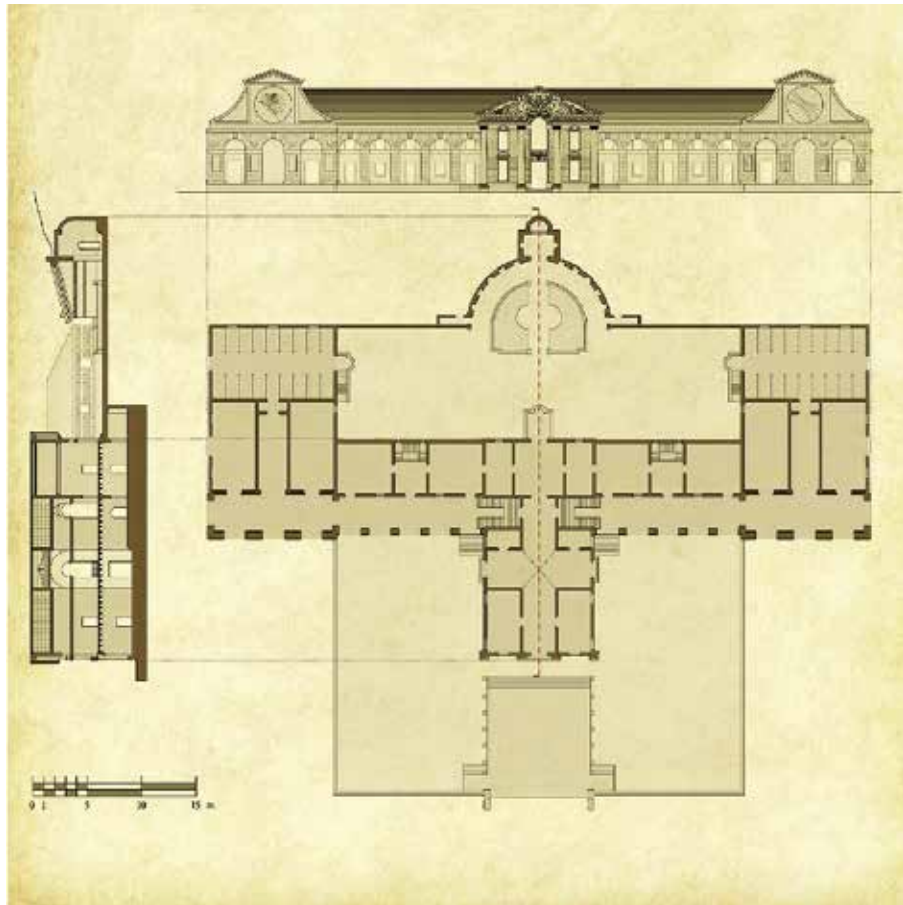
Palladio, Villa Barbaro, facade, plan, section. [Drawing: Veronica Riavis]
